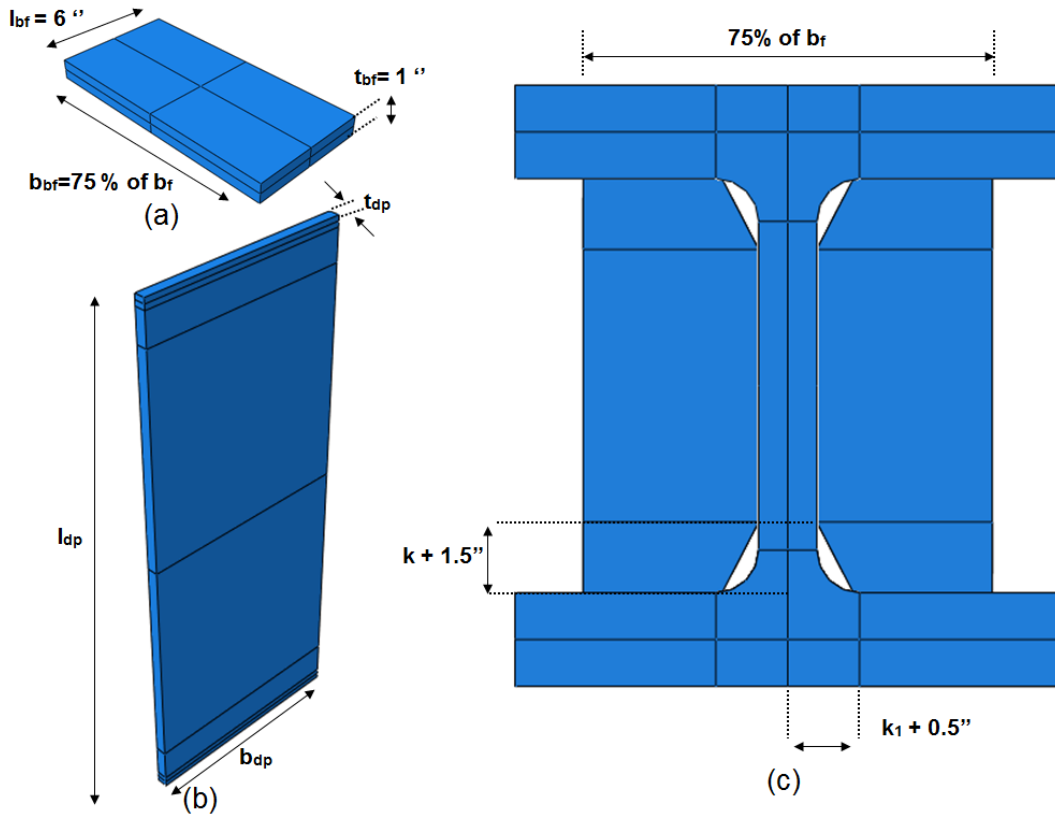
(a) Loading Plate dimensions (b) Doubler plate dimensions (c) Continuity plate dimensions
